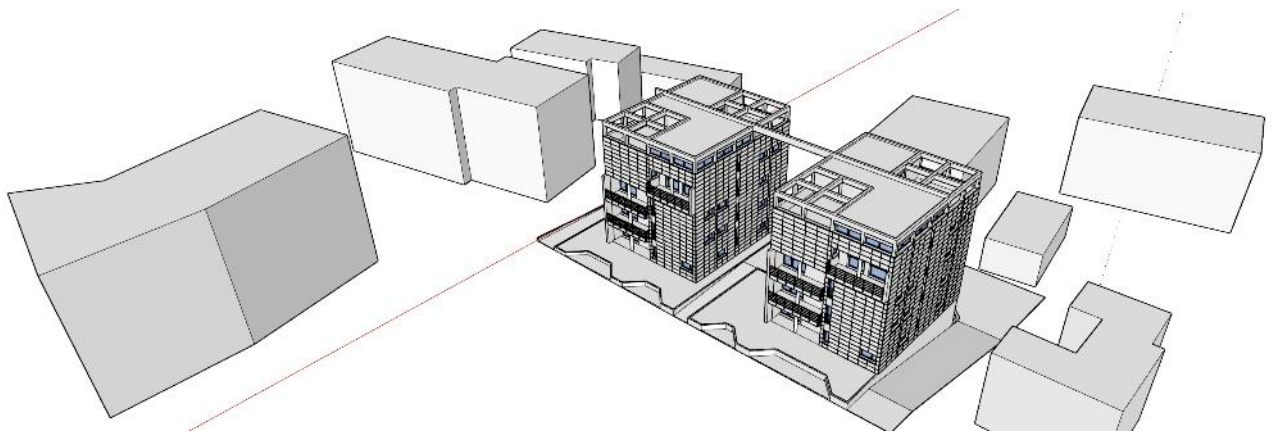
Demo-site 4, 3d drawing of the existing building
